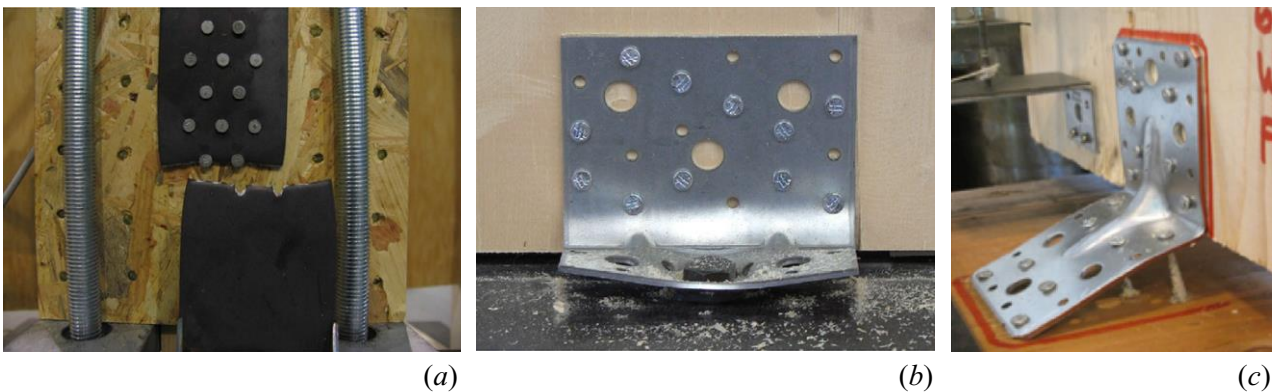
Brittle failure mechanisms of typical CLT connections: (a) tensile failure of the net cross section of the metal sheet of hold downs, (b) pull-through of the anchoring bolt of wall-to-floor angle brackets and (c) withdrawal of the nails of wall-to-foundation angle brackets (*image credits: Follesa et al. [113]*).
